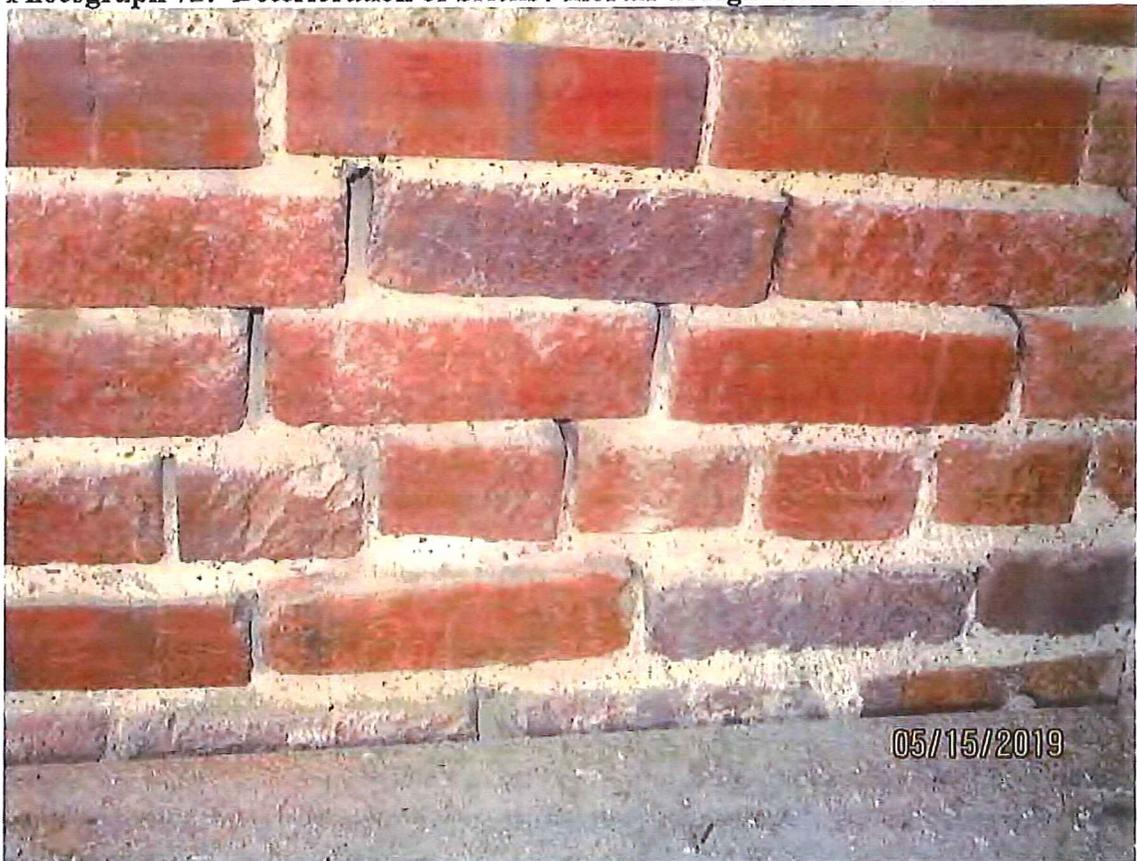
Deterioration of bricks / mortar at right wall on fourth floor.
